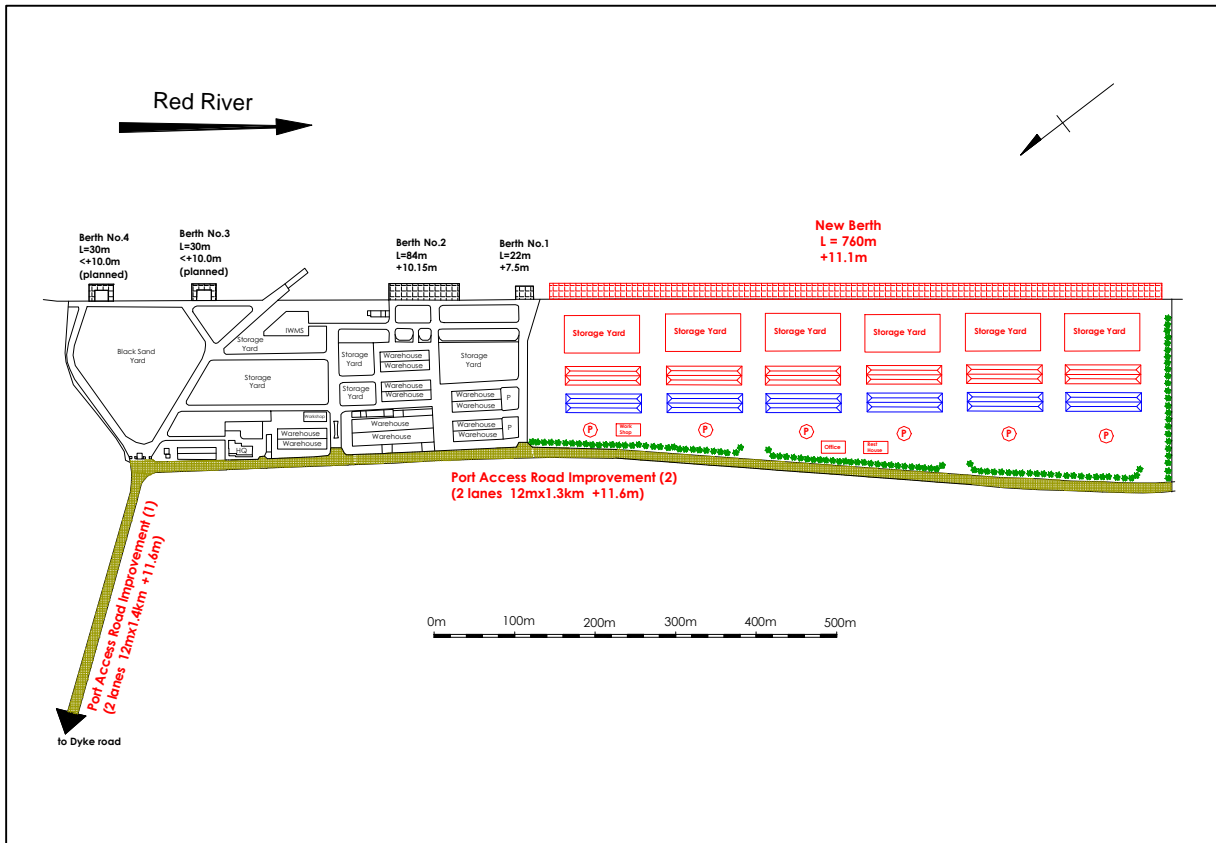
Master Plan of Khuyen Luong Port (2020)
